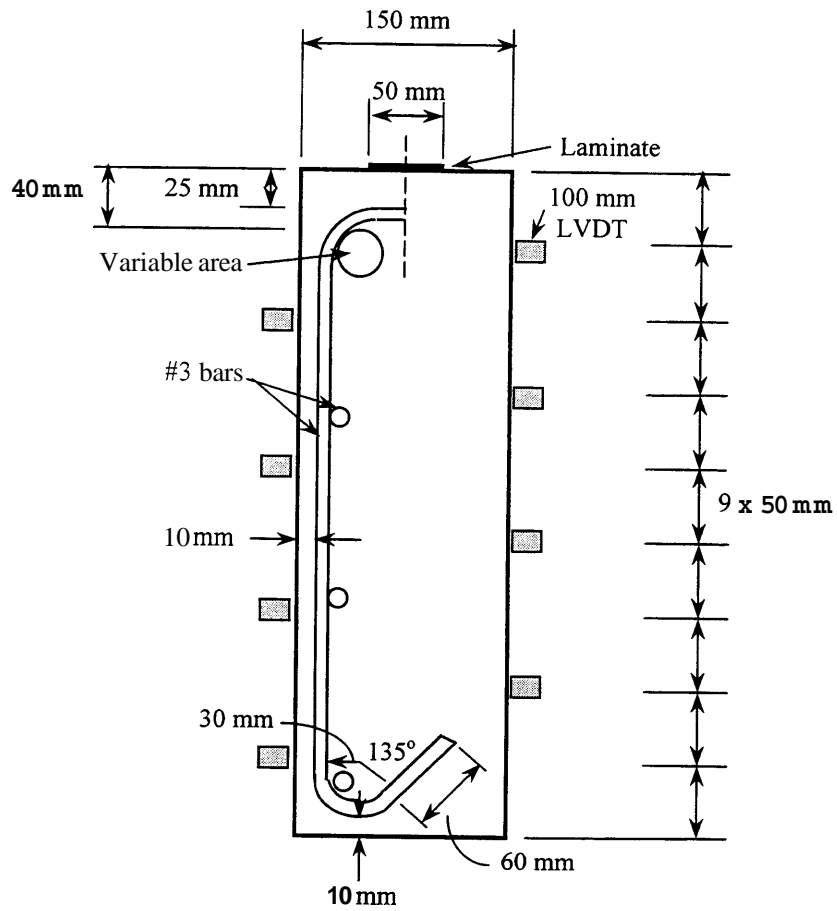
Beam cross-section showing stirrups at shear span and LVDTs at midspan
